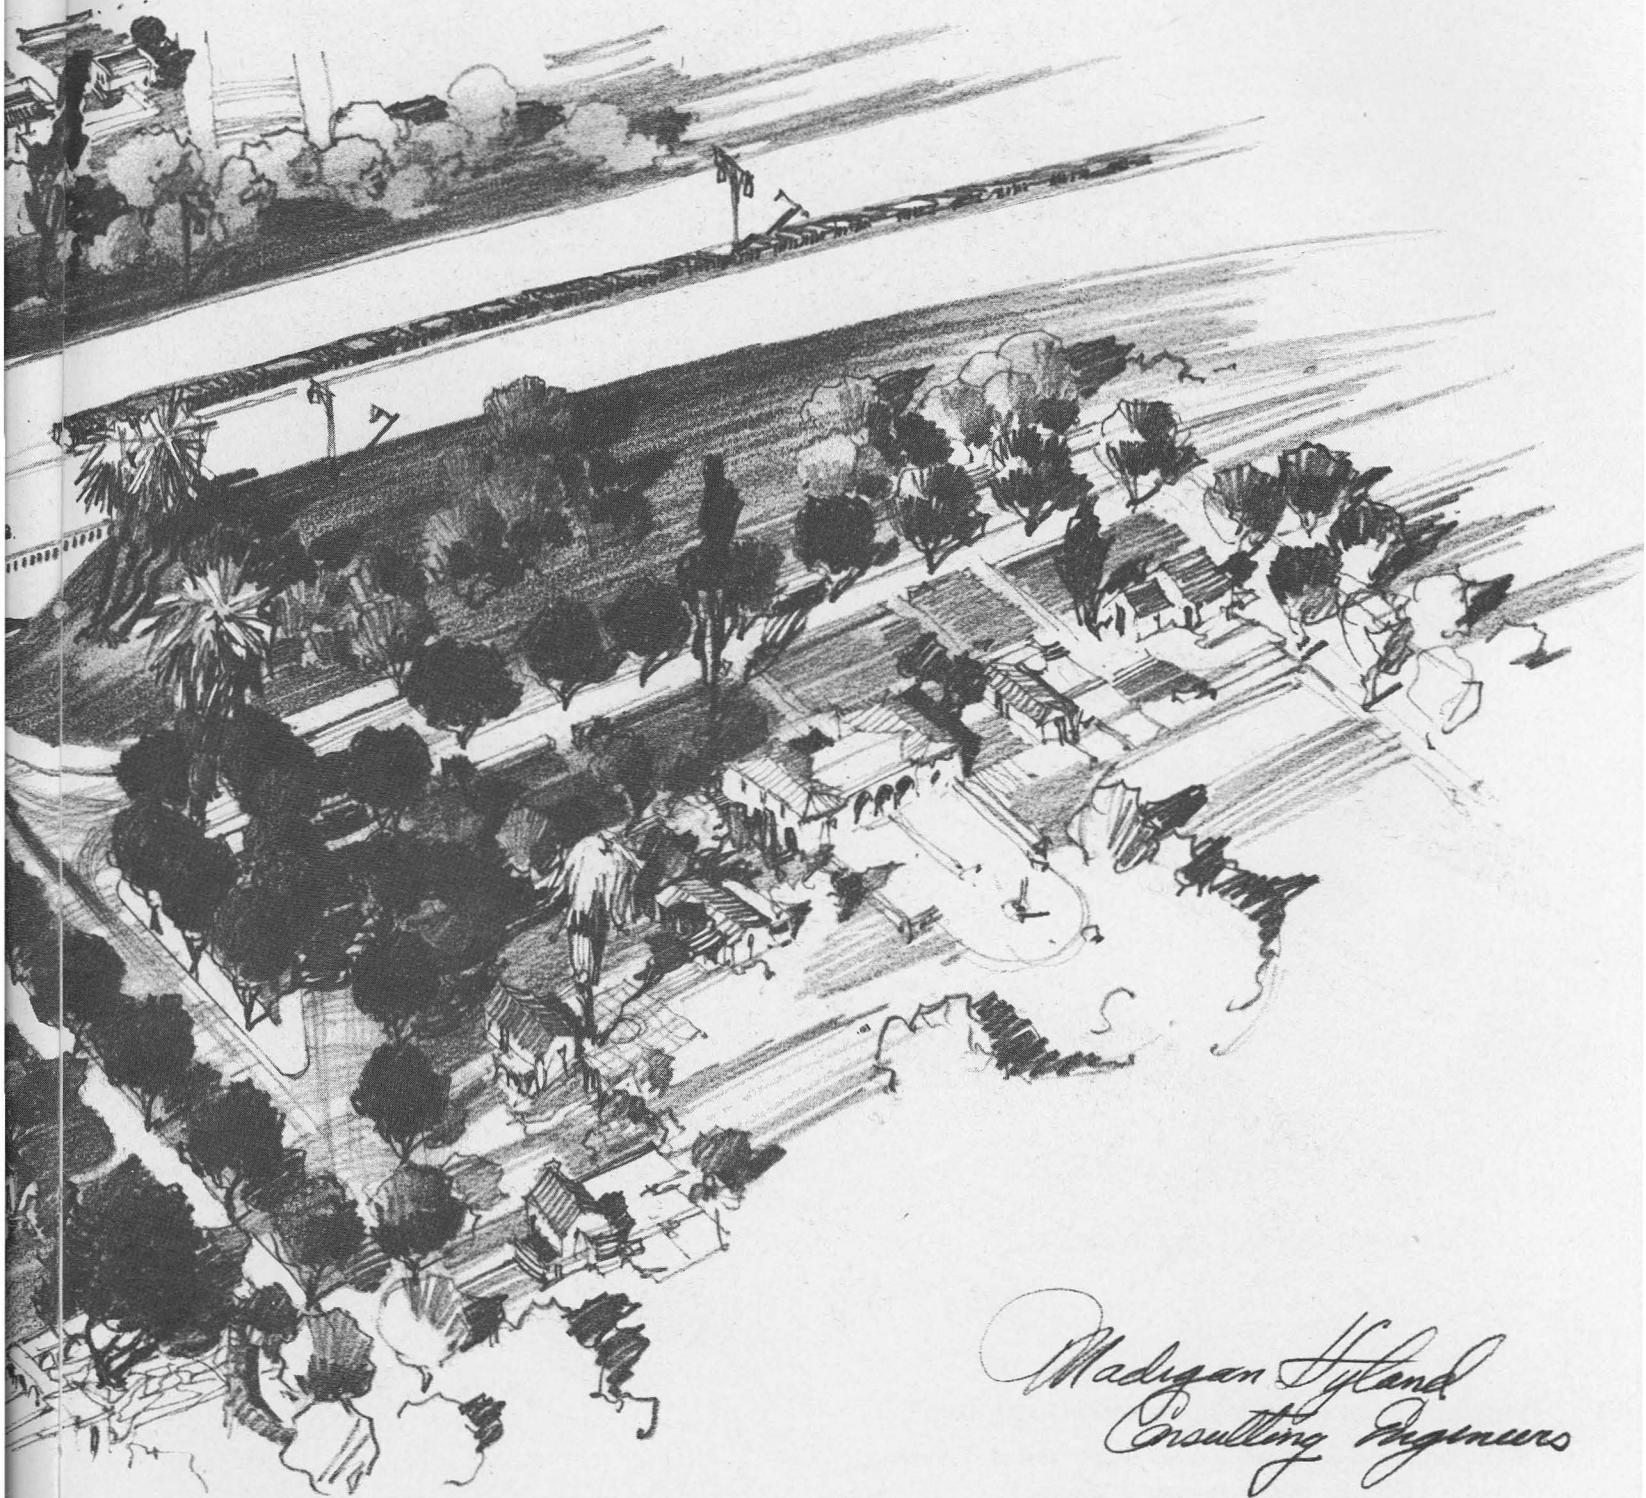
PARKWAY ON FILL CROSSING OVER STREET
